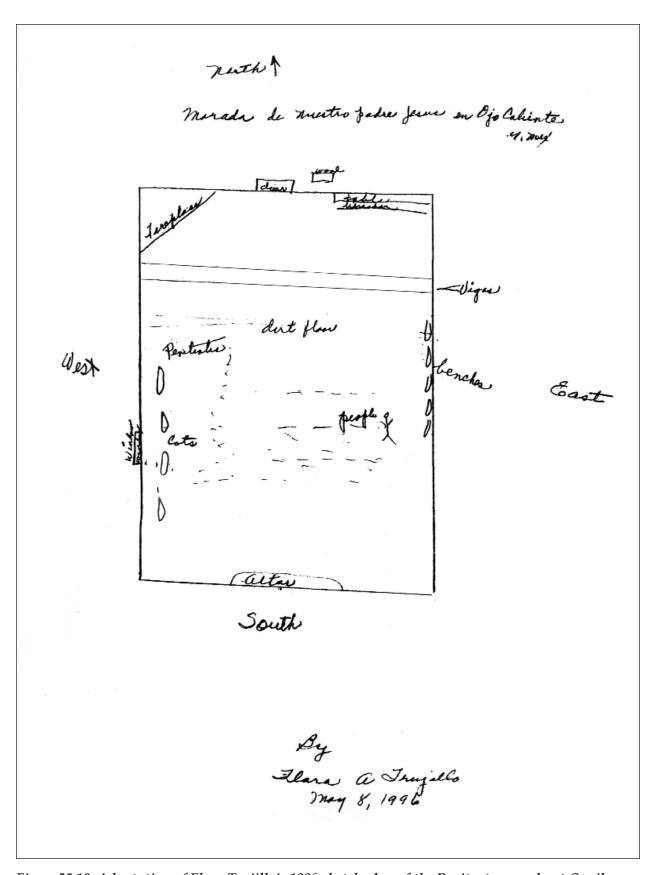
Adaptation of Flora Trujillo's 1996 sketch plan of the Penitente morada at Gavilan.
